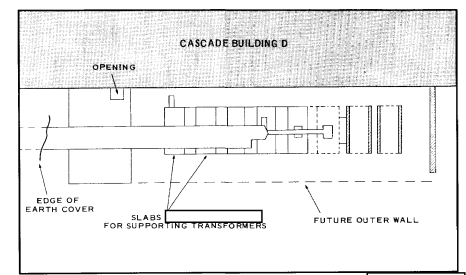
PLAN VIEW OF INTERIOR OF SUBSTATION D1 (UNDER CONSTRUCTION).
